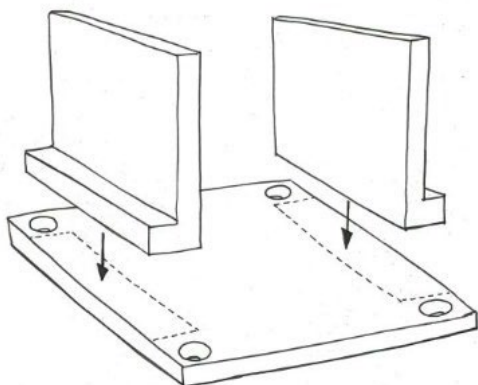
ELT house foundation socket design (*Critical Concrete 2019*)
